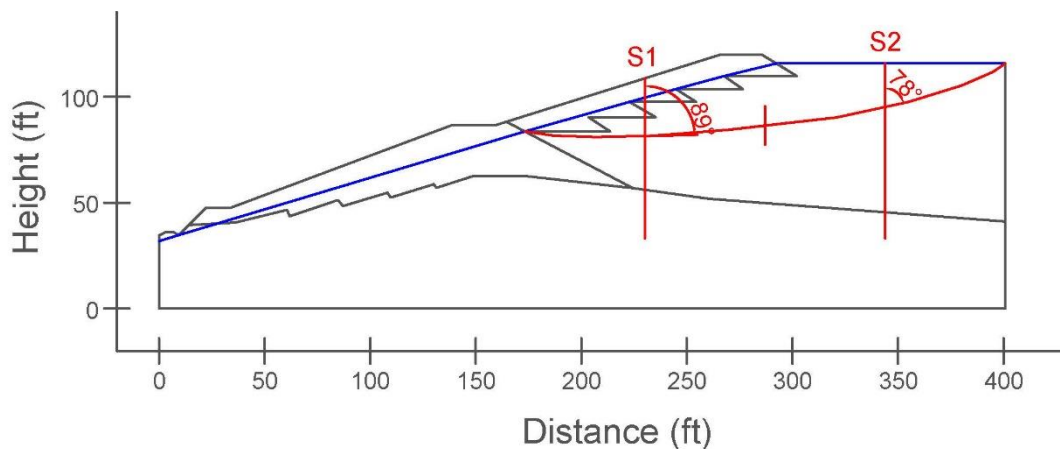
Sub-sectioning of the cross-section and failure plane for Mochi-Koshi Tailings Dam 2
